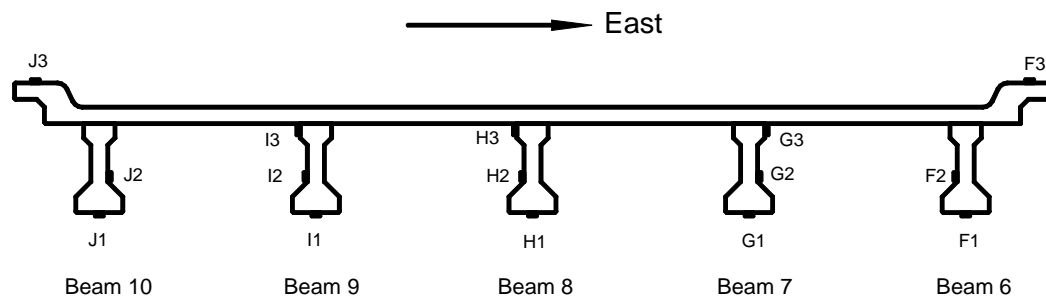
Strain Gage Locations – Lampasas River Bridge – Span 2
